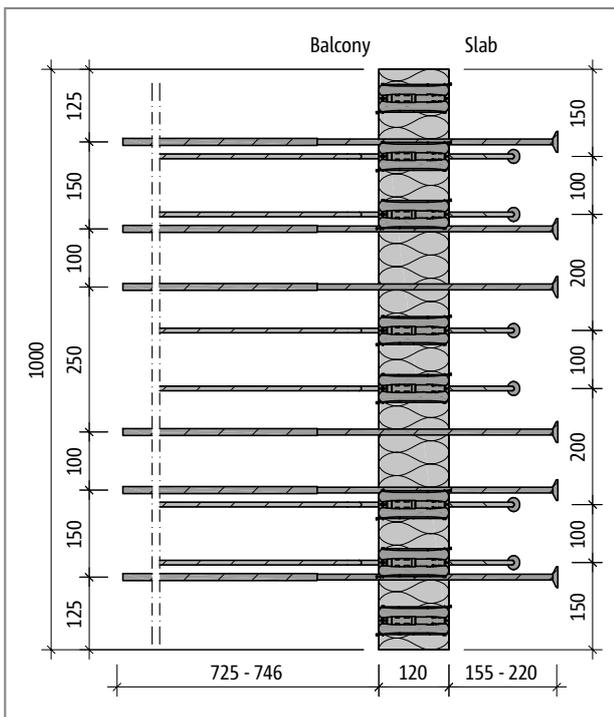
Schöck Isokorb® XT type K-U-M2: Product plan view
